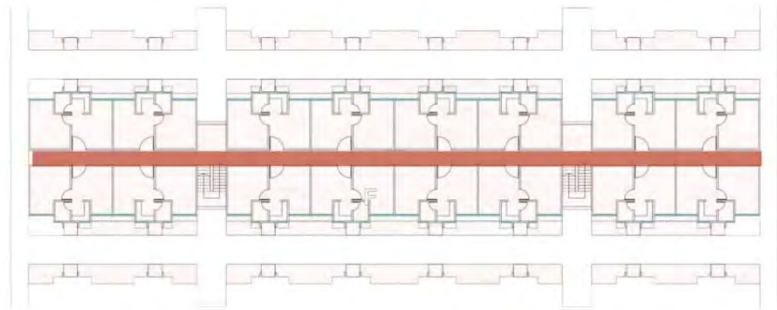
Floor plan of two building type with detail unit plan of BRP. Source: (Ahmed S. , 2017)
